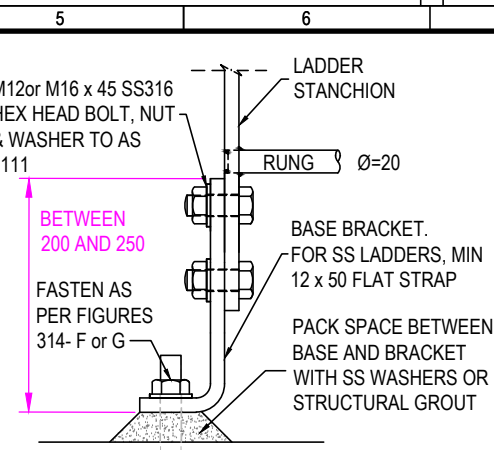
C (SECTION VIEW). FLOOR BRACKET
